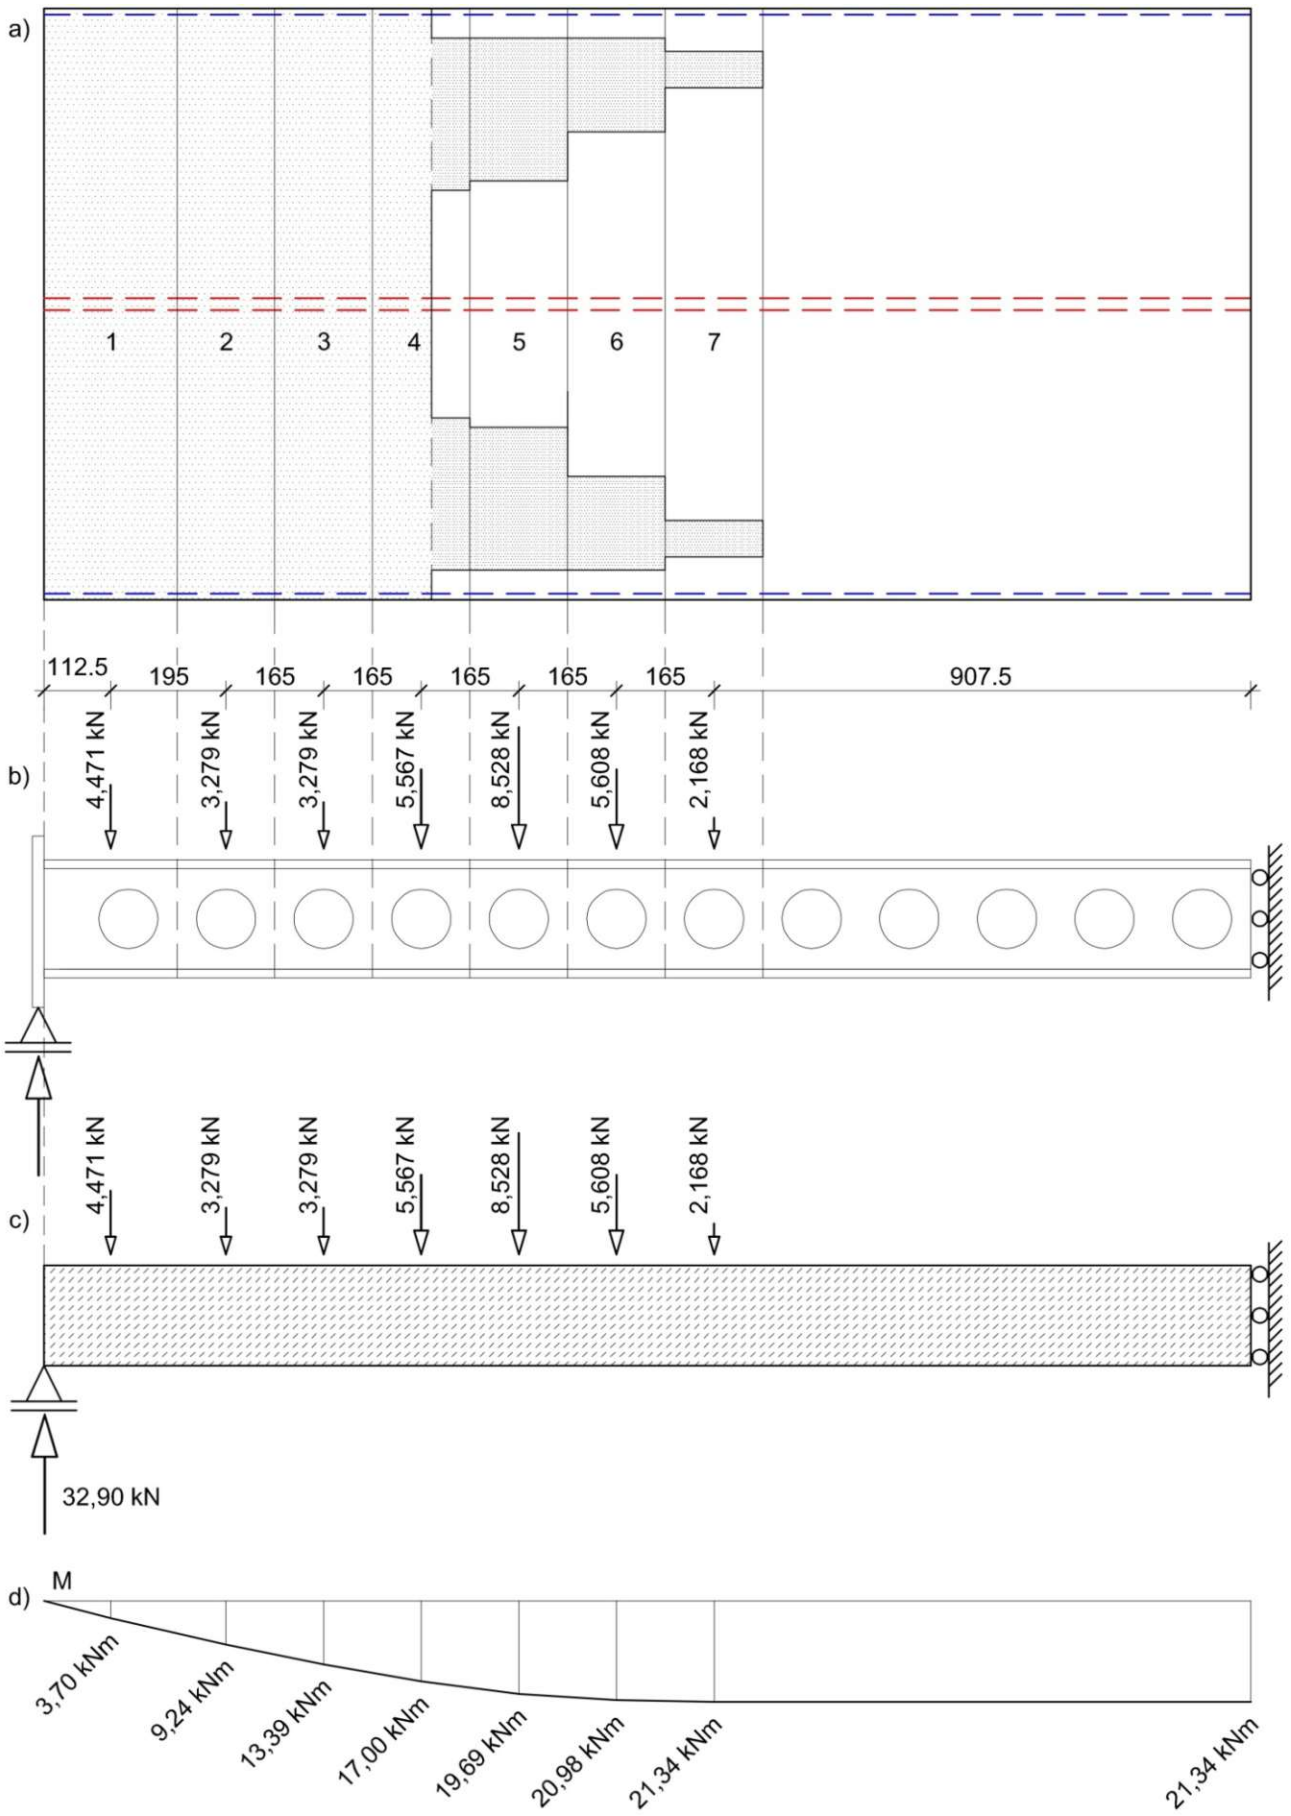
Model design for concrete: a) loaded area, top view; b) side view; c) the loaded concrete beam; d) bending moments
